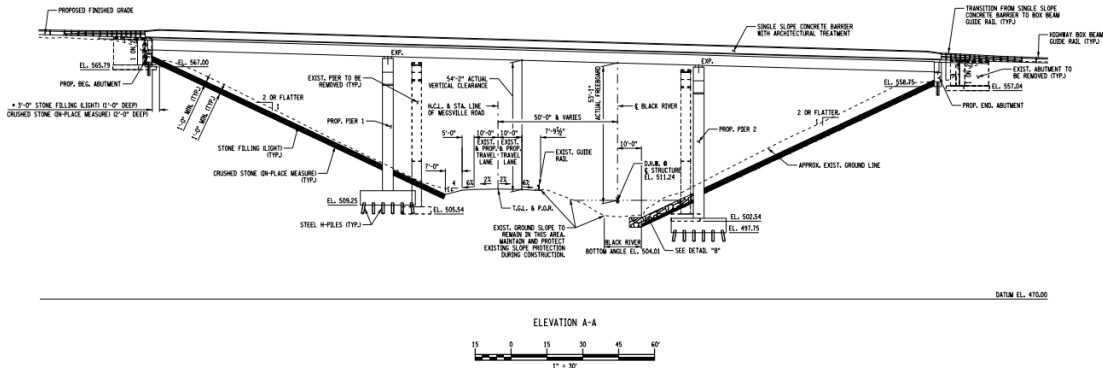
Elevation view of I-87 S.B. Bridge over Meigsville Rd.
